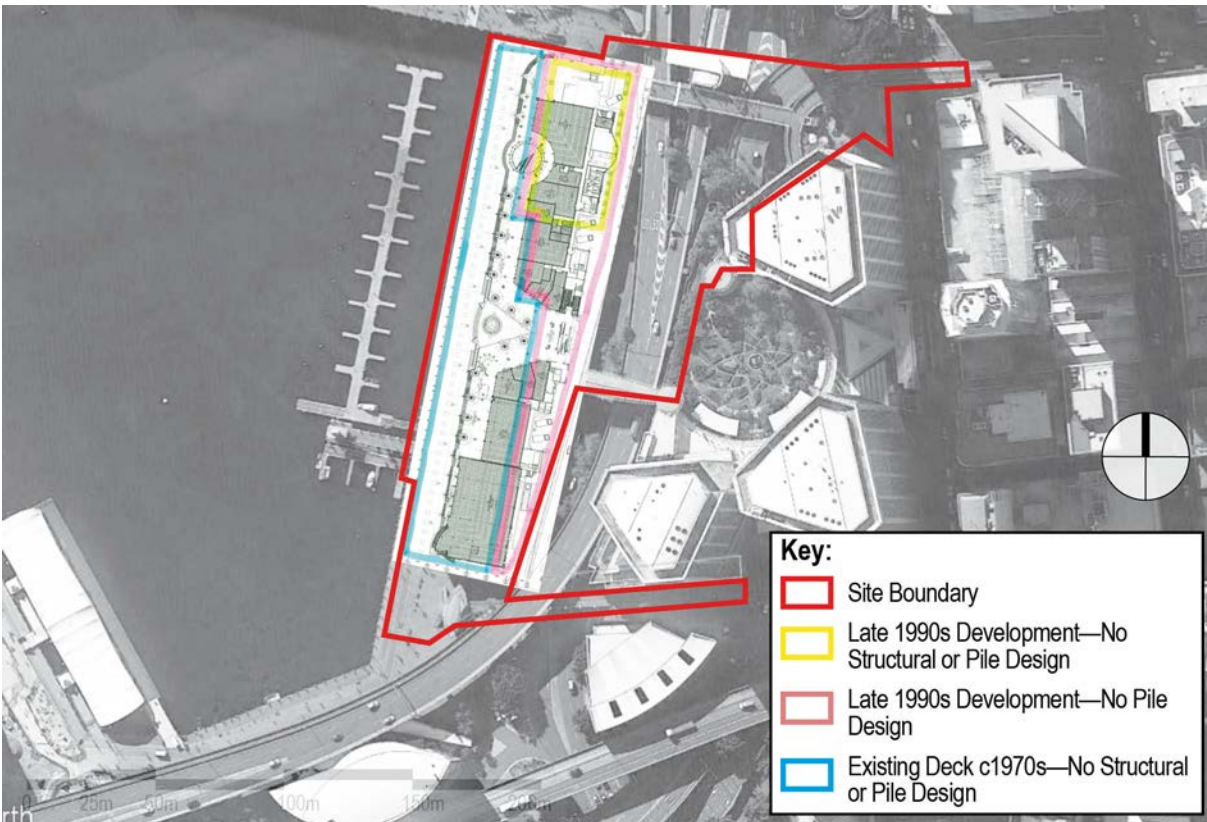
Plan of existing building showing extent of varying foundation structures. (Source: LendLease with Brookfield Partners Ltd and GML overlays 2017)
